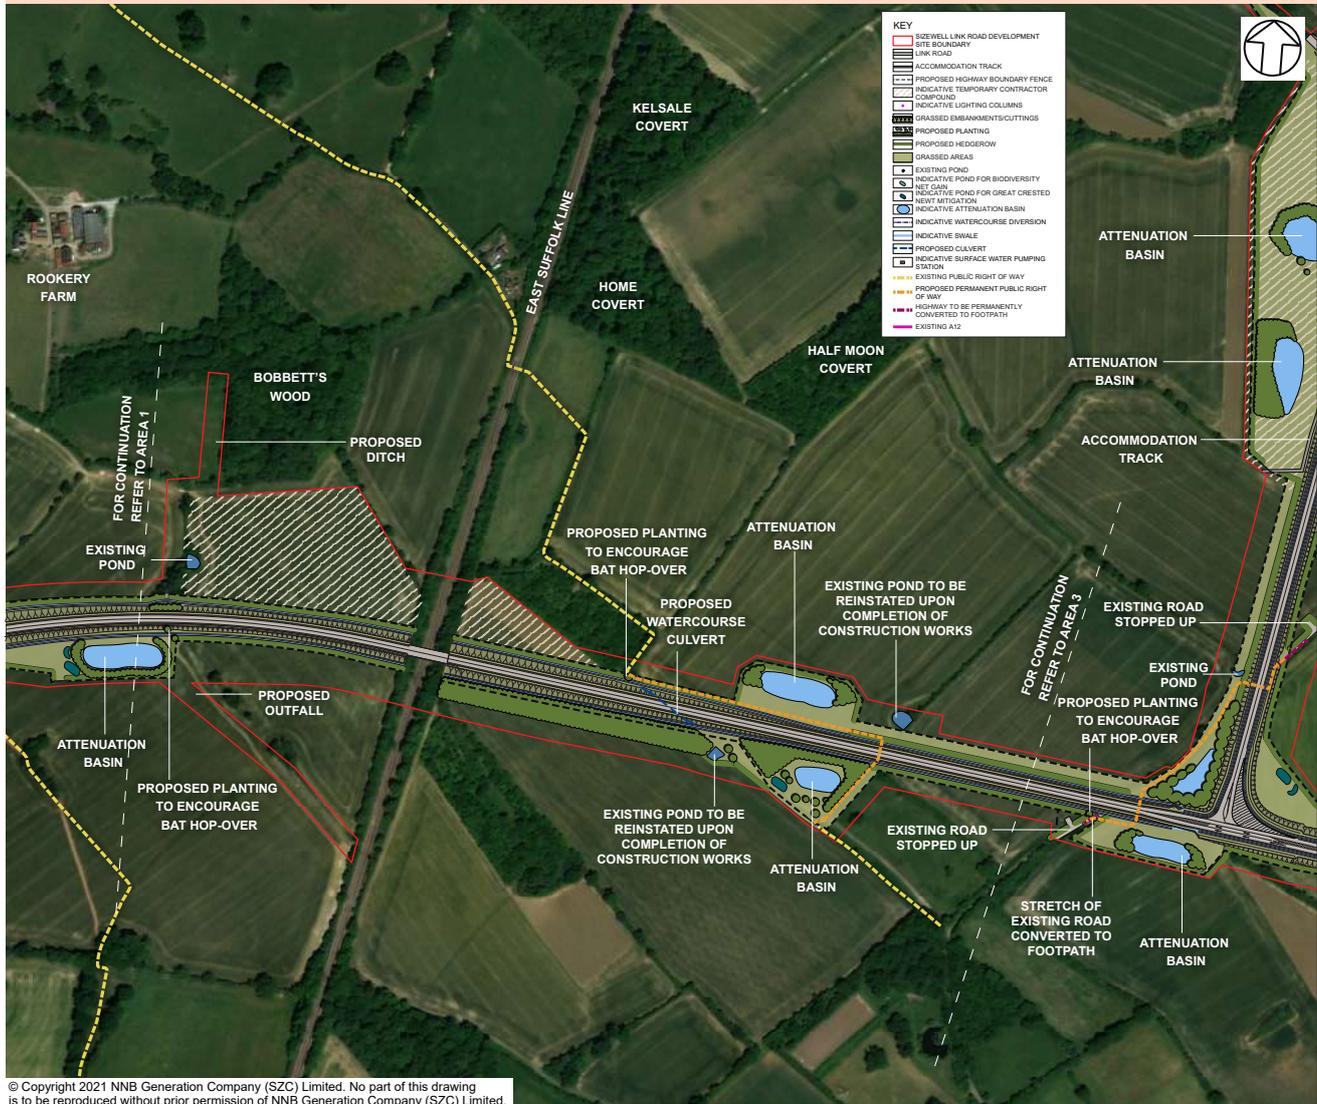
D: Illustrative masterplan of the Sizewell link road – Inset 4
